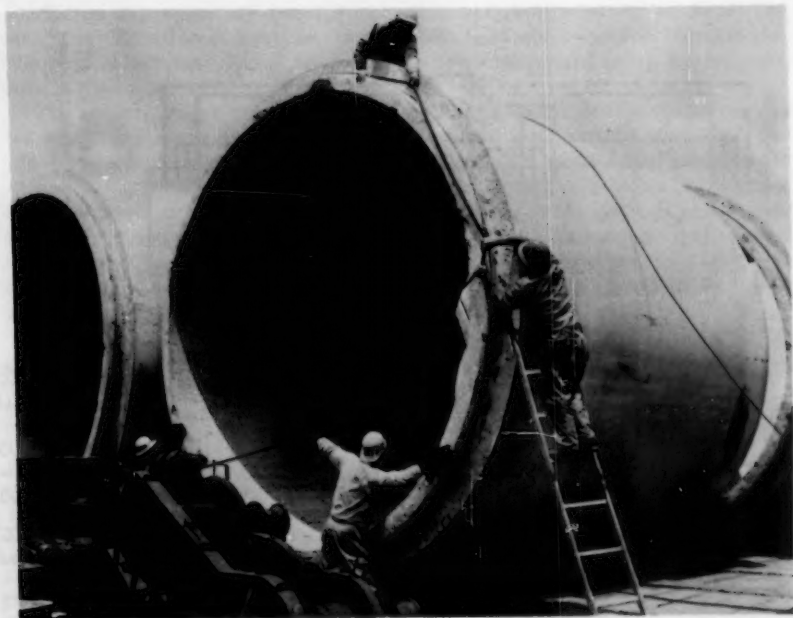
WORKMEN INSTALLING RUBBER GASKET ON UNIT OF 14'-0" OCEAN COOLING WATER CONDUIT
